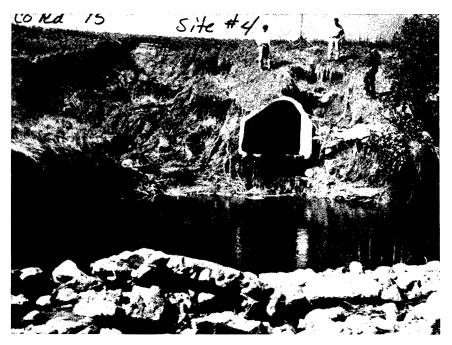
View of roadway embankment erosion and scour at culvert outlet, Williams County Road 15, near Williston, North Dakota (courtesy of North Dakota Department of Transportation).
